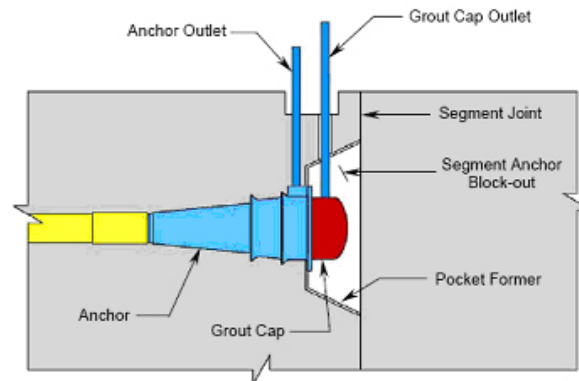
Cantilever Anchorage with Permanent Grout Cap³.
